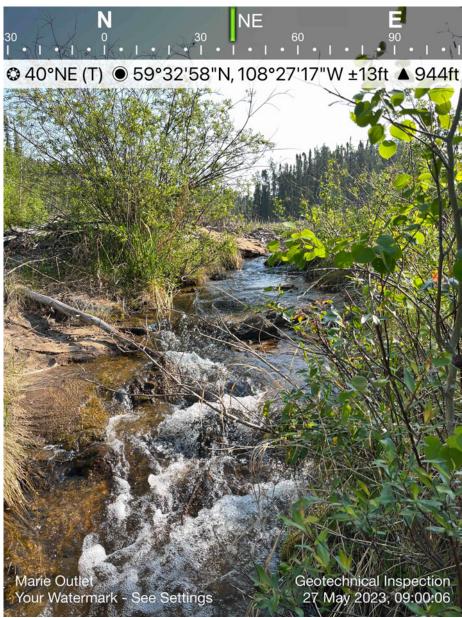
Marie Reservoir Spillway looking northeast (May 2023)
